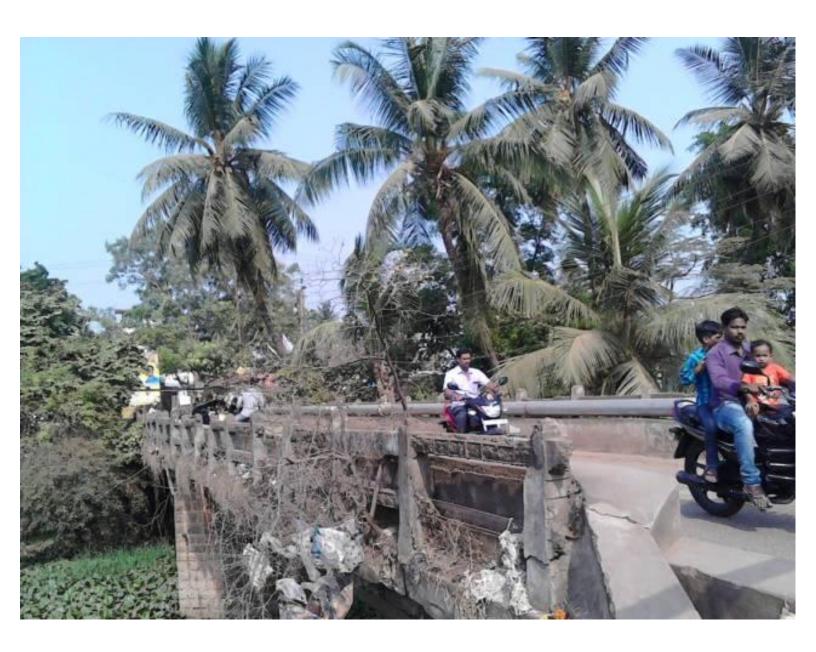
Existing single lane bridge to be dismantled during proposed bridge construction
